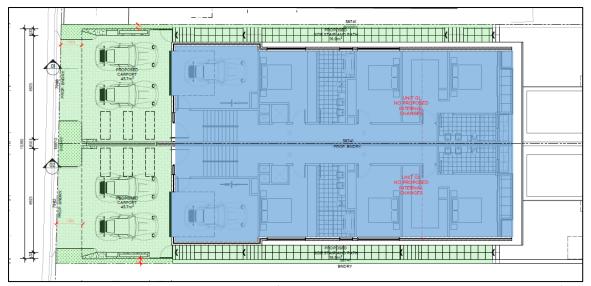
Proposed carports and side pathways (Source: Architectural Plans prepared by AG Projects).
